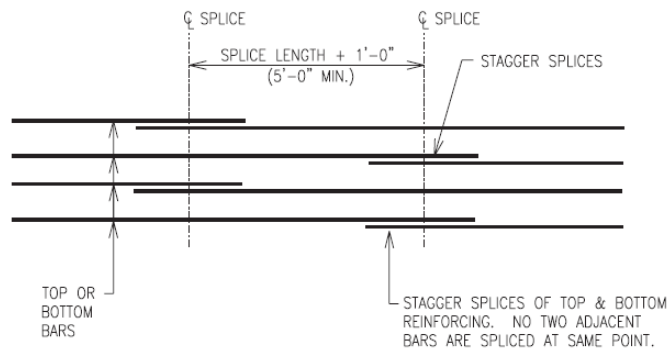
An example of typical staggered lap splice details (source: CRSI 2013).
